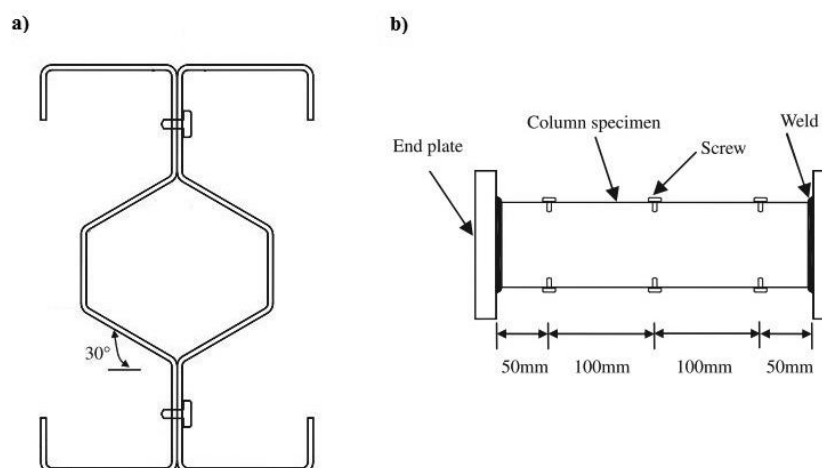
a) Cross section of cold-formed steel member I-shaped and b) arrangement of screw spacing (Zhang and Young, 2012)
